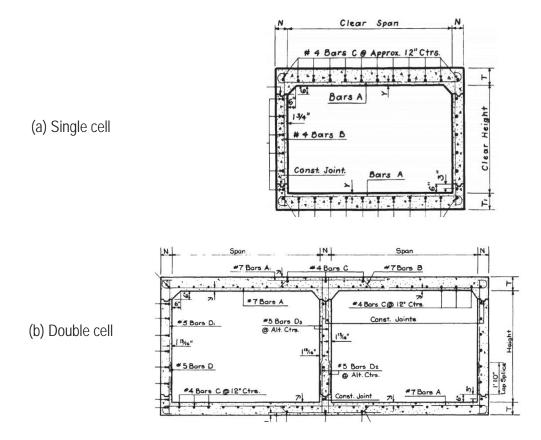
LADOTD standard reinforcement details of single- & double-cell RC box culvert
